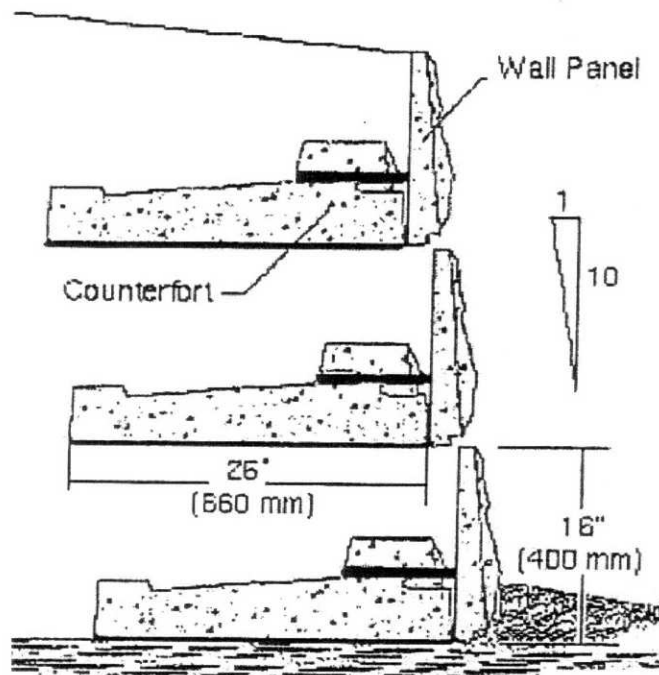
Cross-section view illustrating the dimensions of the counterfort units (no soil reinforcement present).
